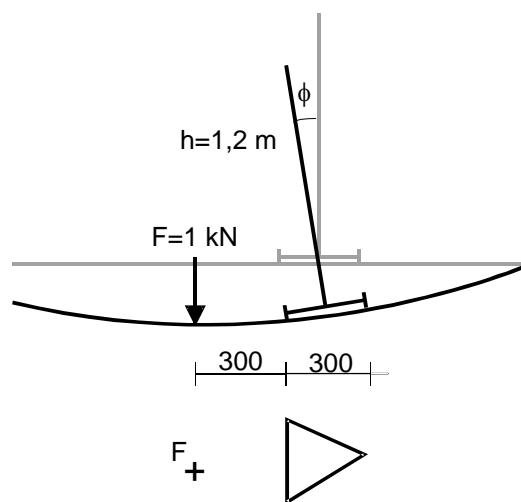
Determination of the slope of the top surface of the floor due to 1 kN point load.
